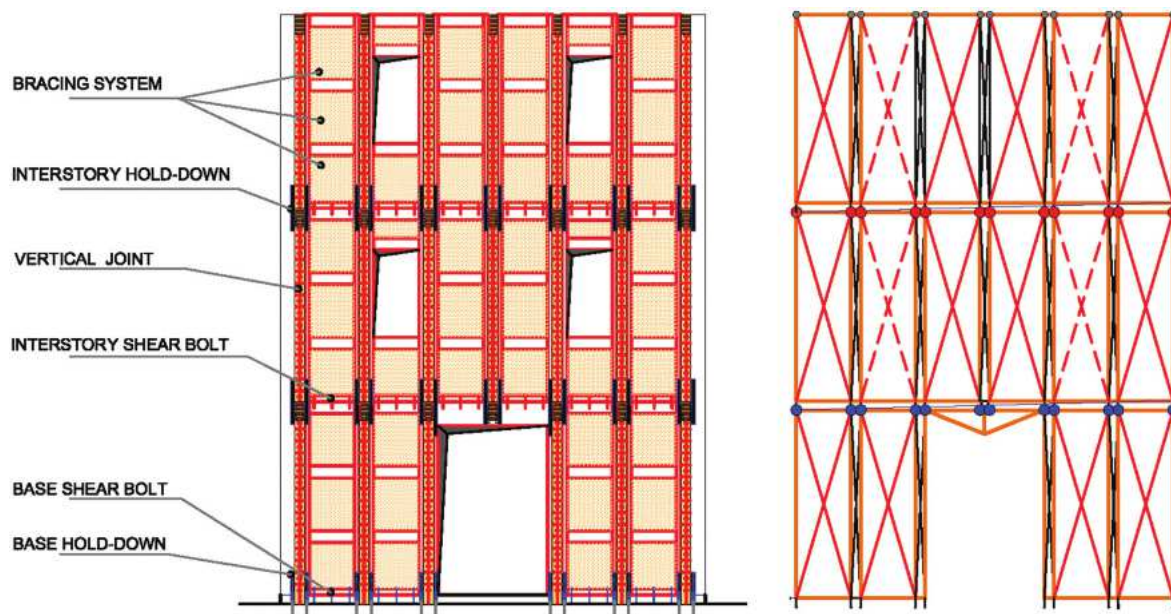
(Color) Wall panels: arrangement of fasteners and bracing system, FEM model, position of nonlinear elements, and mass
